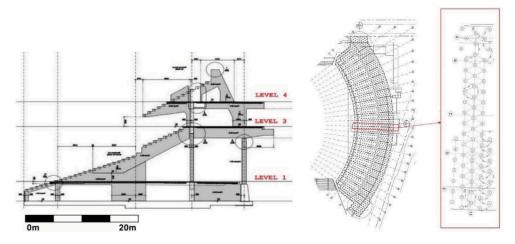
East-west section through Deans Stand (left), stone column general arrangement plan with an enlarged radial grid (right).
